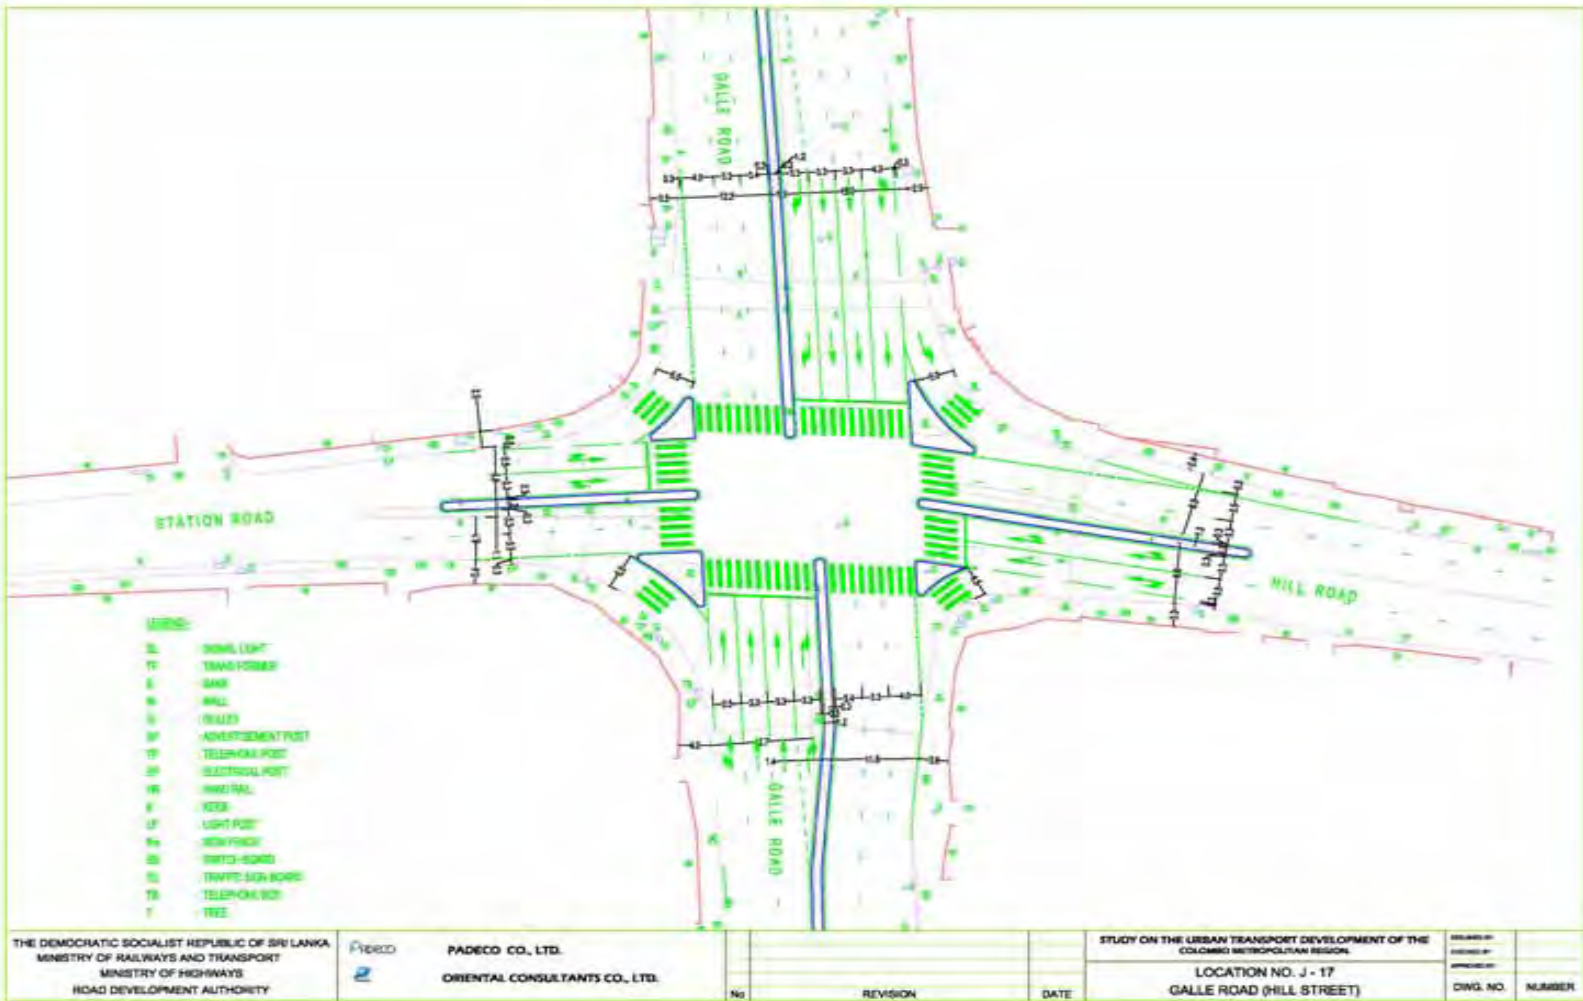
Proposed Geometric Improvements to Hill Street Intersection
